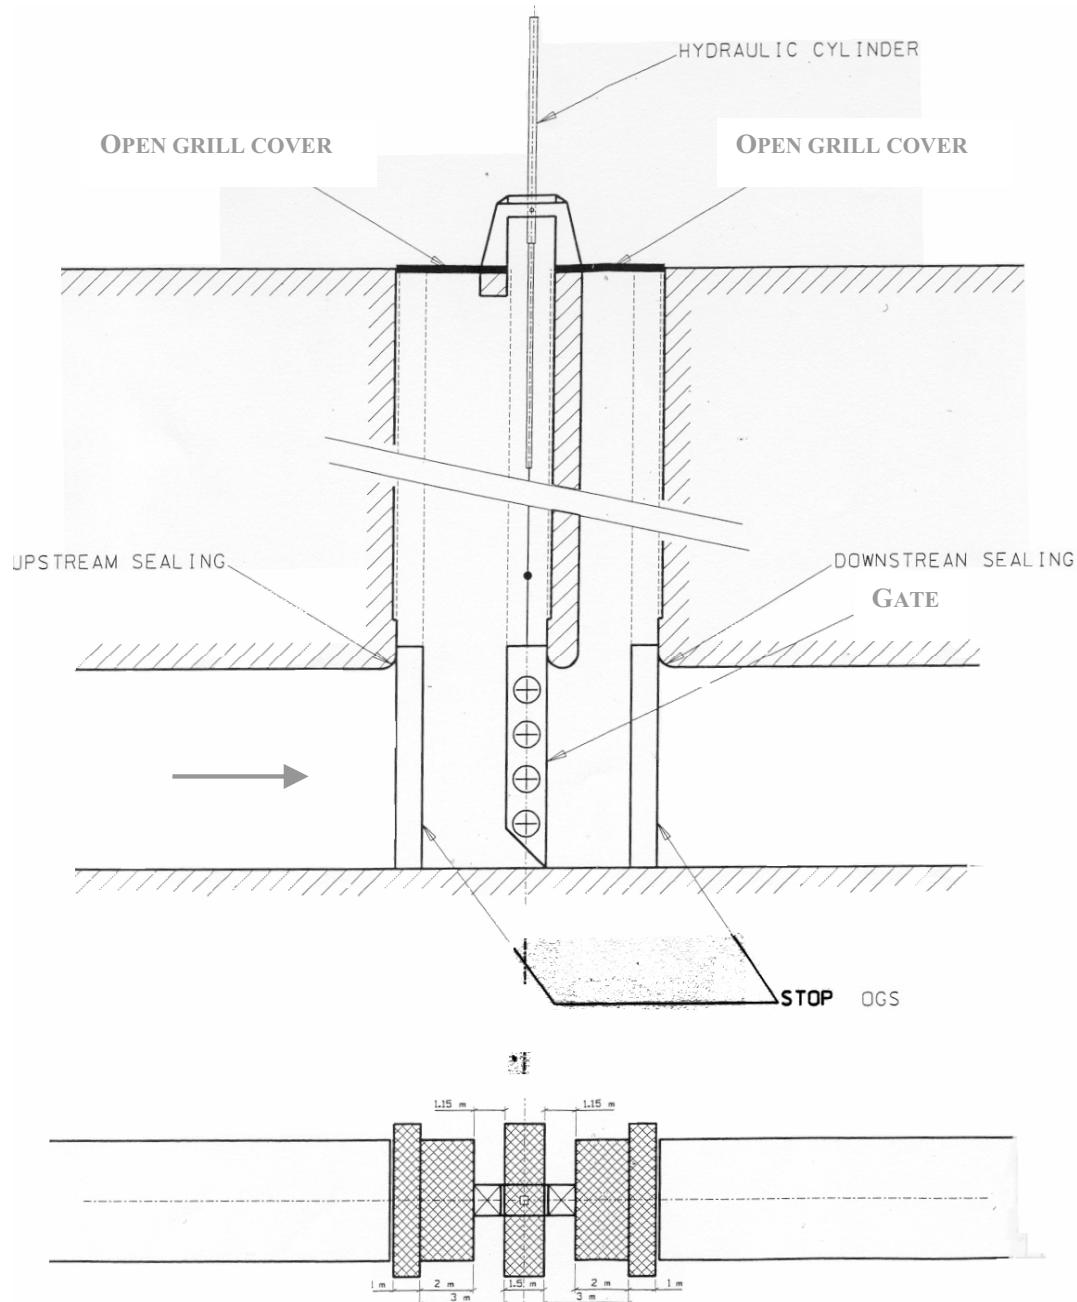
basic layout for a culvert gate with two isolating bulkheads
